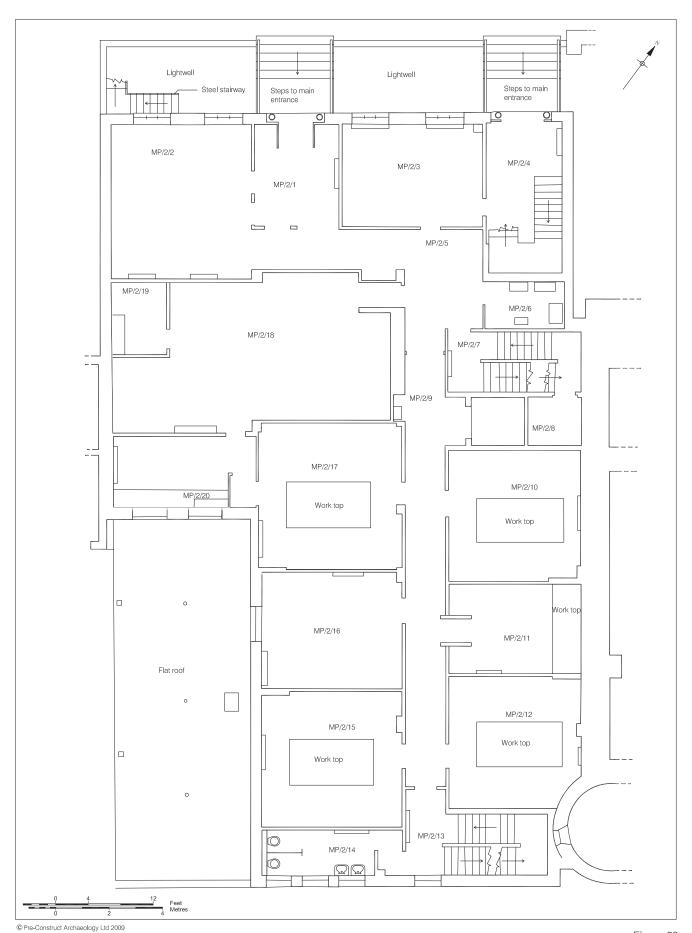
First Floor Plan 1-2 Montague Place British Museum 1:100 at A3
